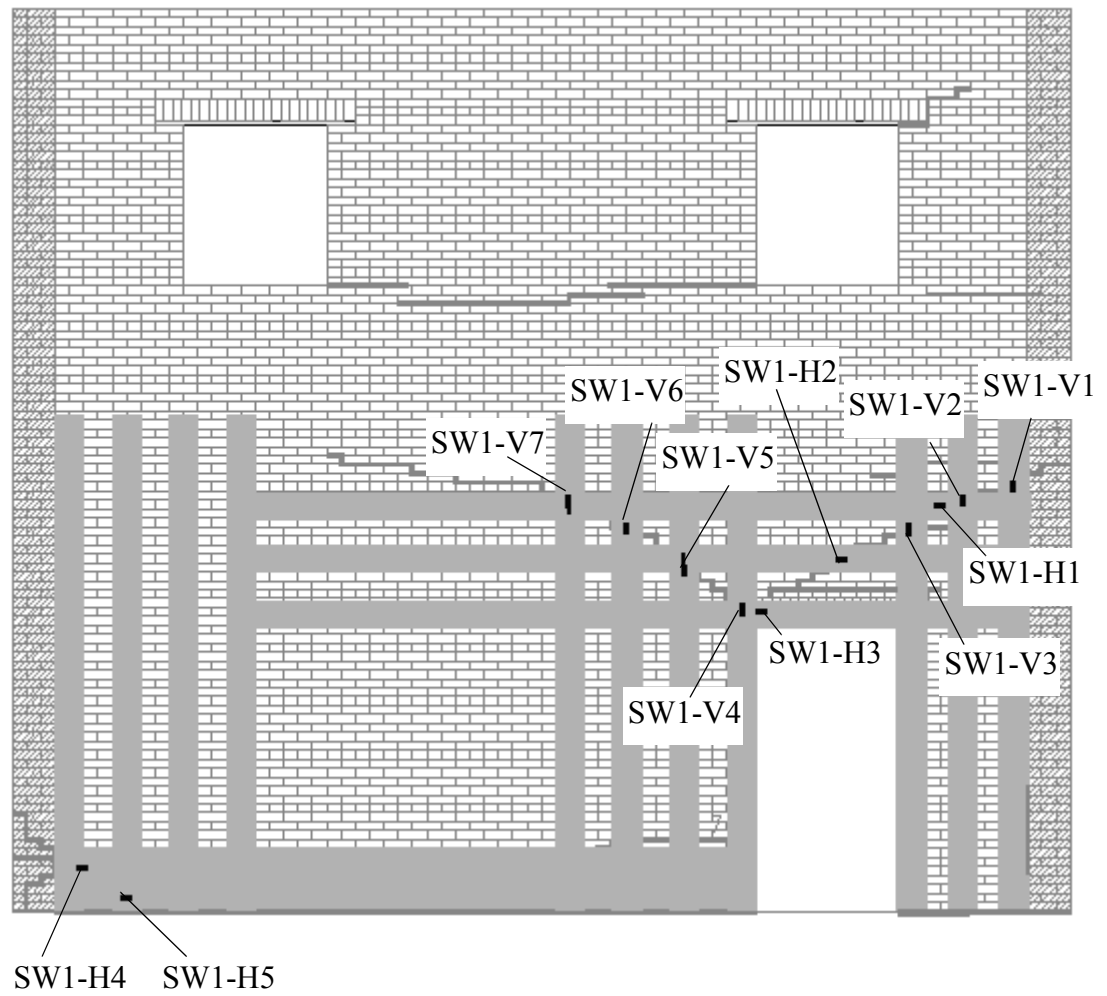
Elevation of Wall 1 illustrating the location of strain gages attached to the FRP overlays.
